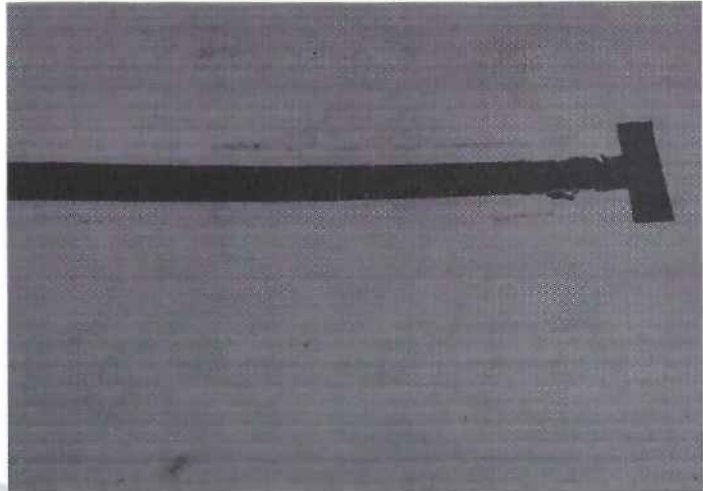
Settling pool floor and spalling paint at lane line
